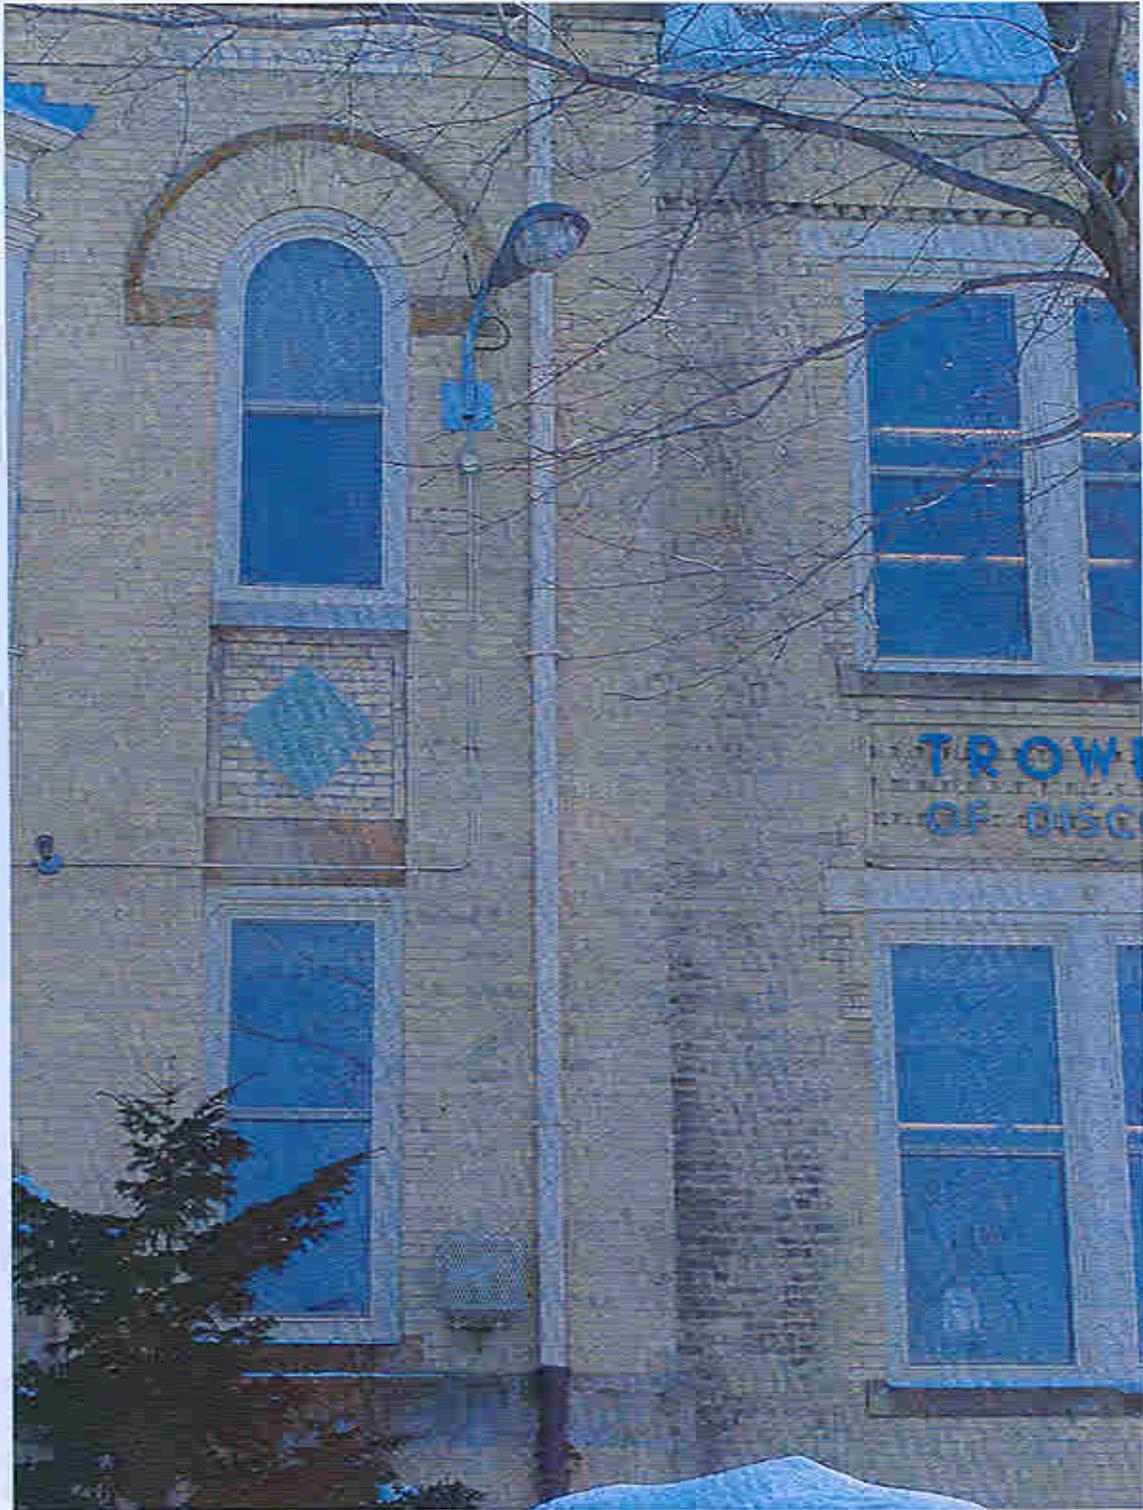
Damaged brick from leaking gutter above would be replaced
